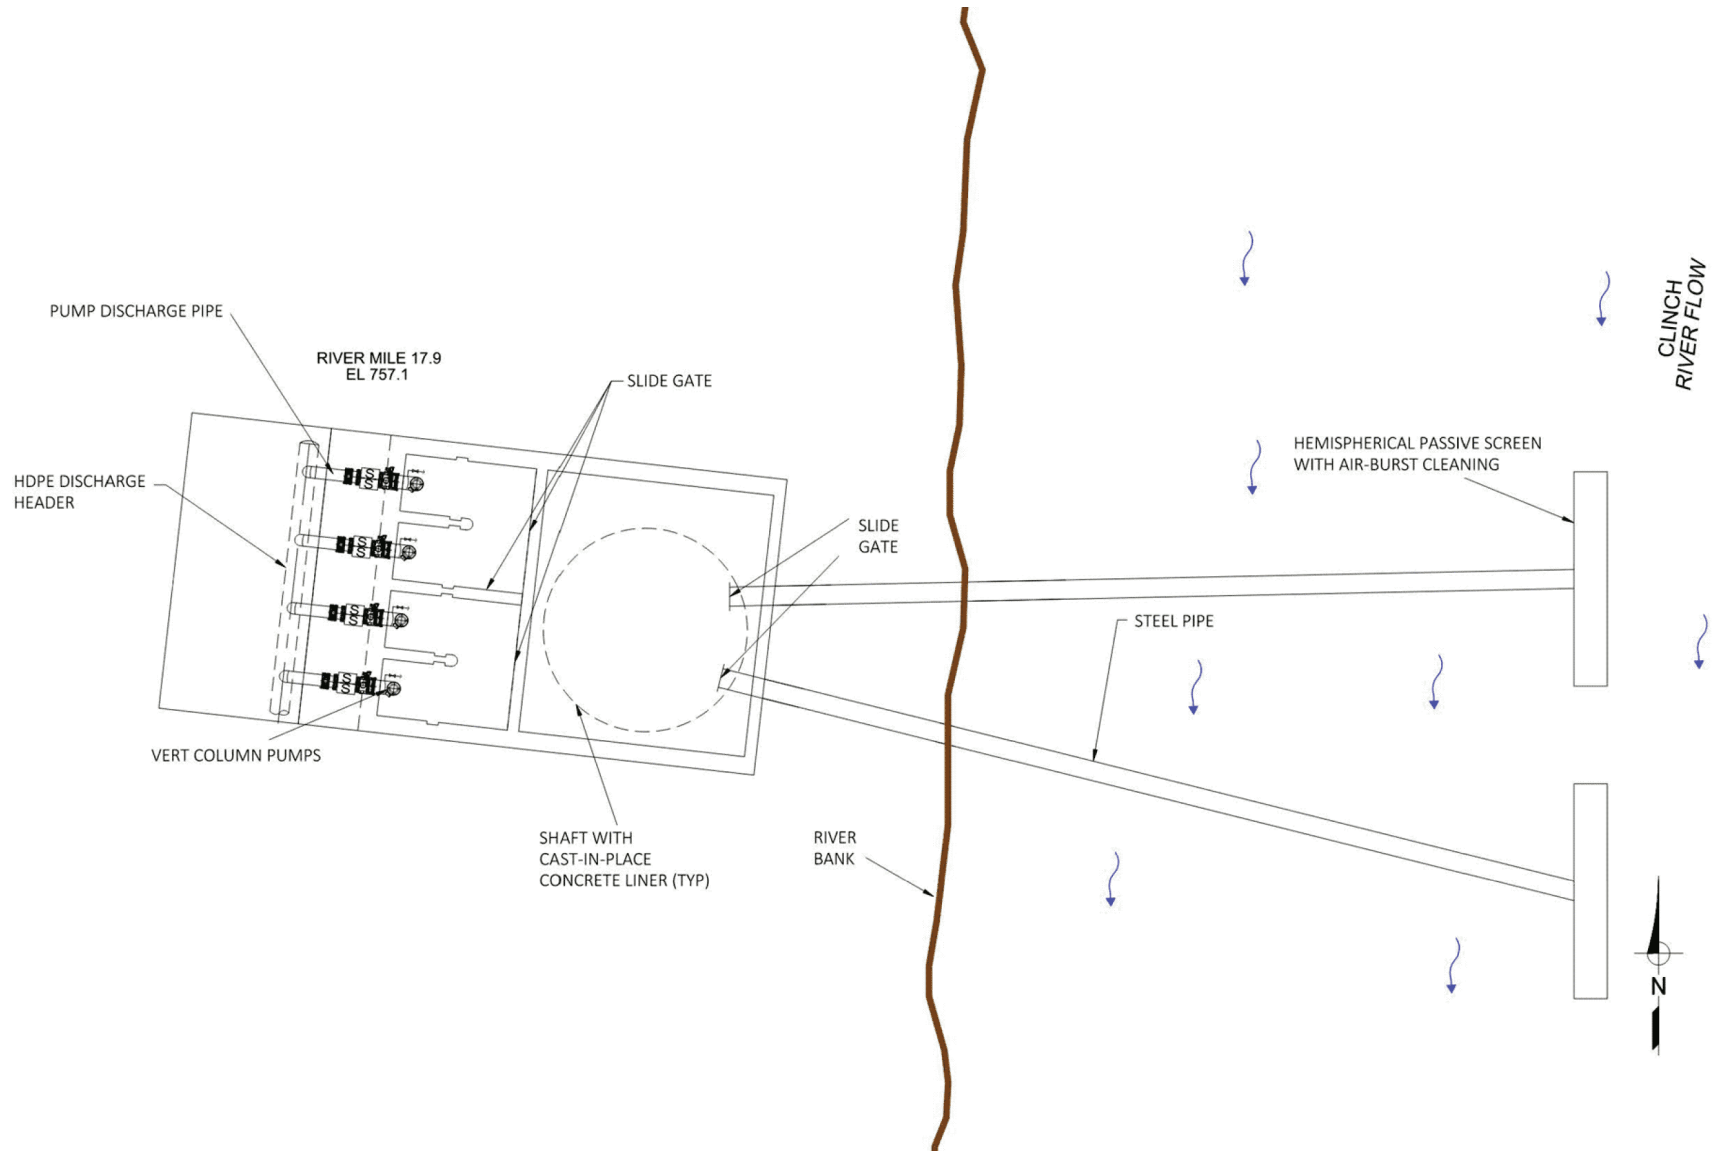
Submerged Offshore Intake Alternative Structure Plan
